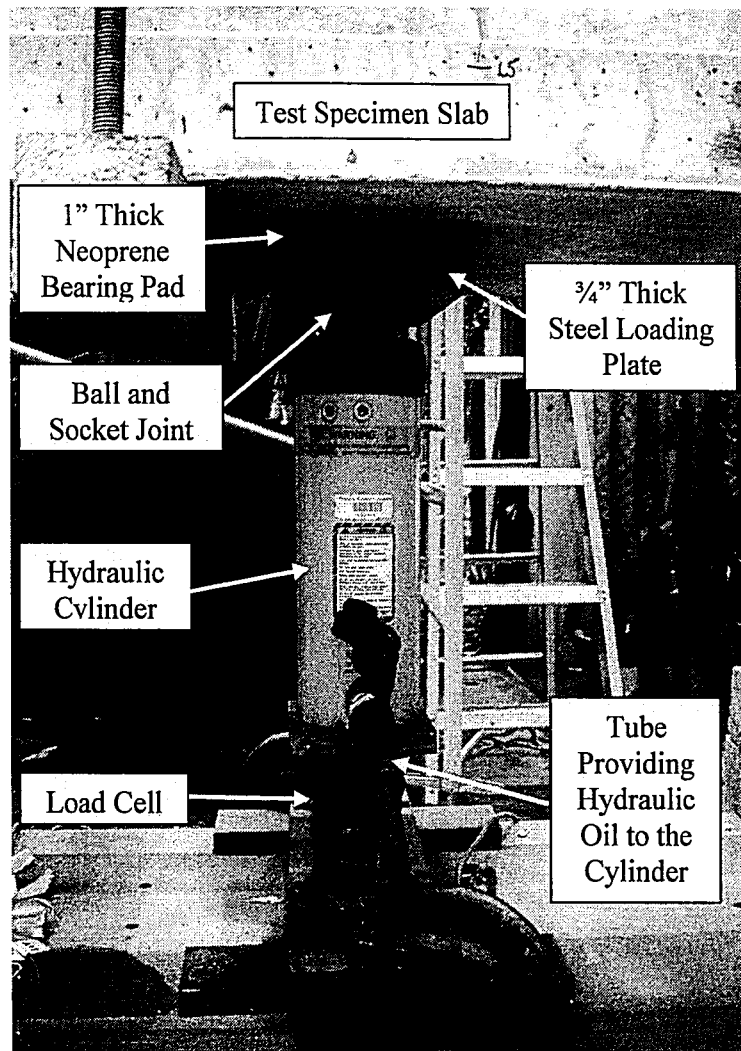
Close-Up View of the Hydraulic Cylinder
